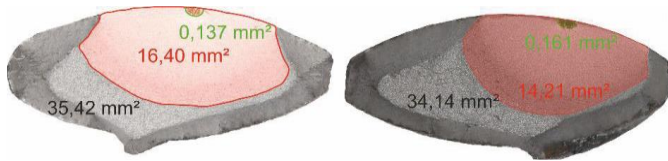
Fracture surfaces of two prestressing wires after a fatigue test. Green: pre-existing defects, red: crack propagation during the fatigue test, light gray: residual fracture surface [6].
